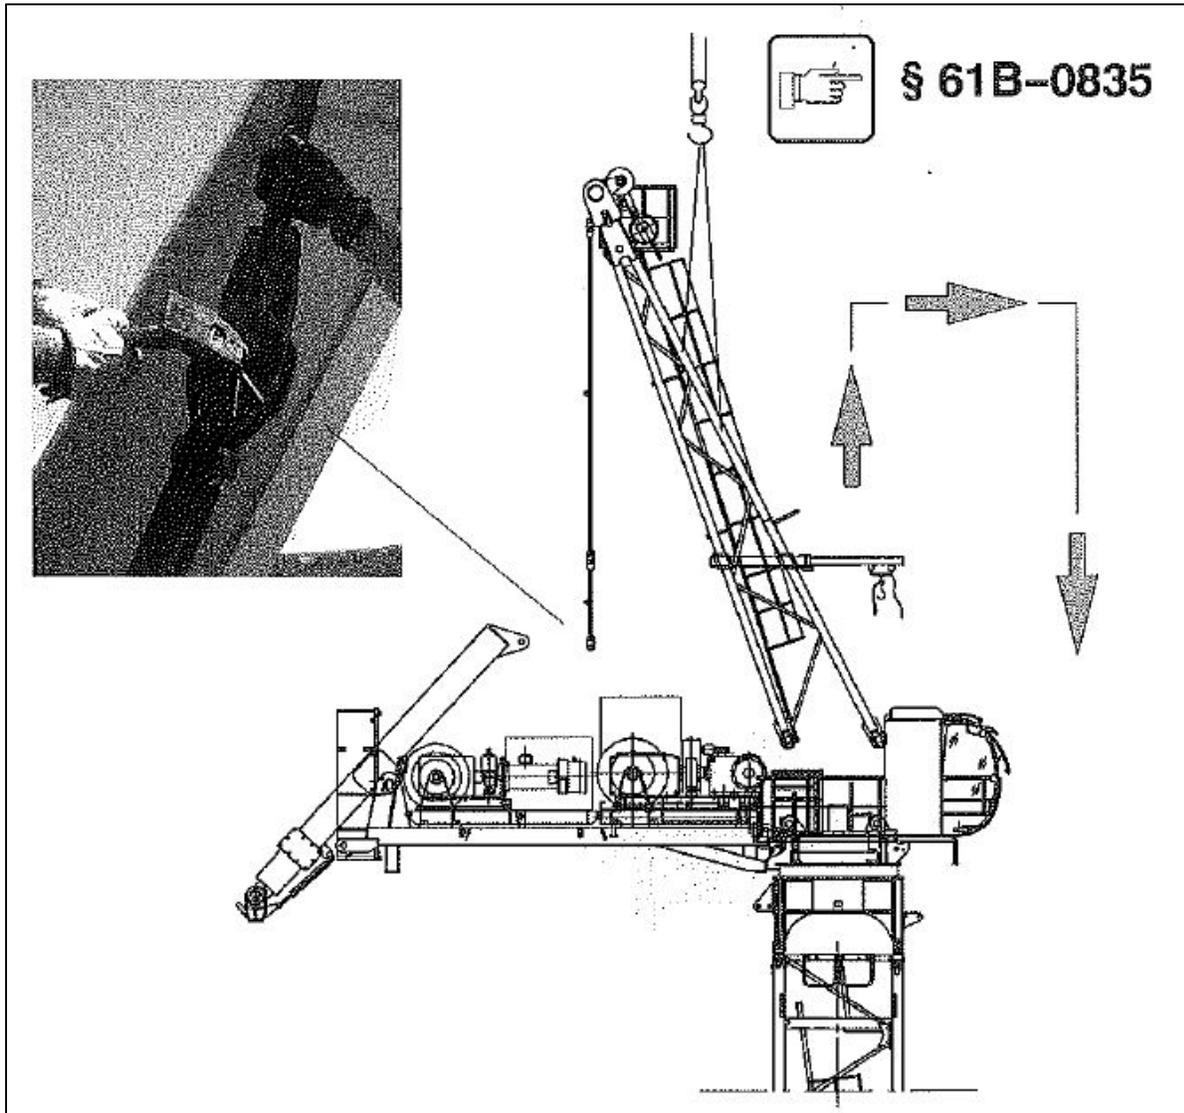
Schematic drawing of the Potain tower crane apex being hoisted by a mobile crane after the four locking pins had been removed from the turntable mounting lugs. (Taken from Potain tower crane specifications manual)
